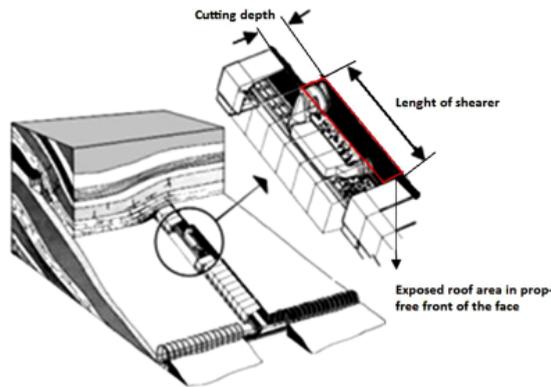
Exposed roof area in prop-free front of the face in longwall mining (Saedi et al., 2010)
